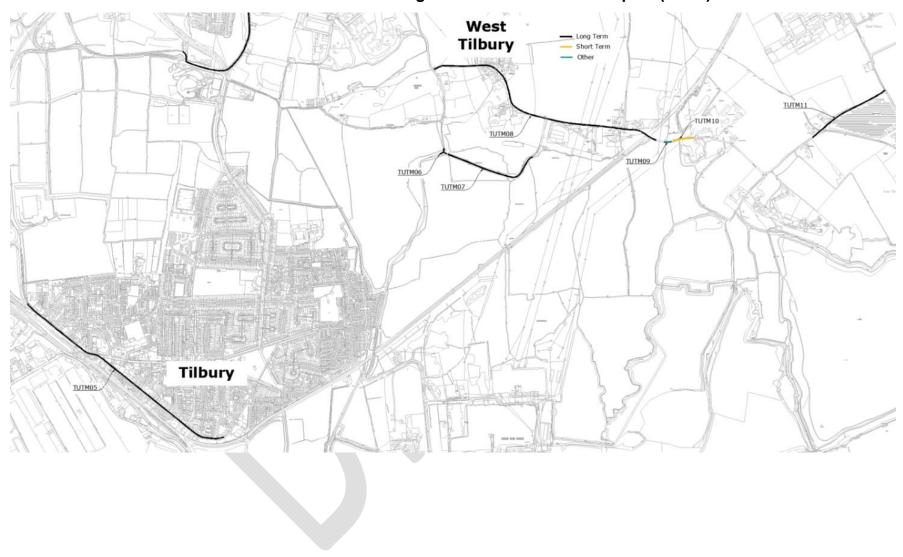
Tunnel traffic management measures location plan (2 of 2)
